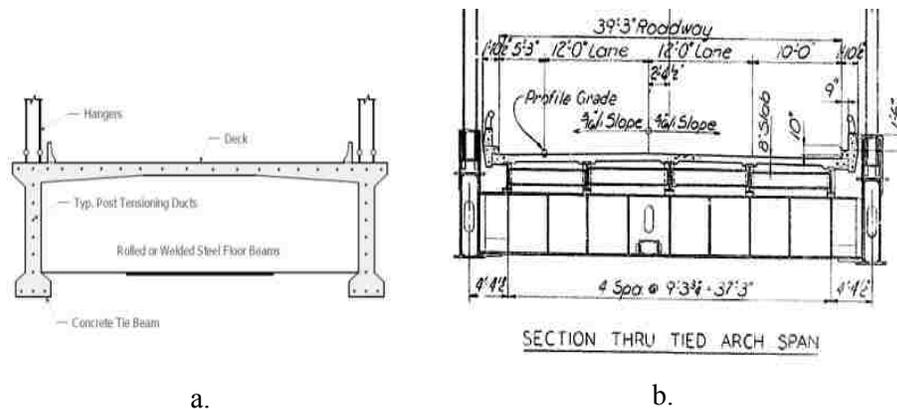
Alternate Bridge Cross Section from a. Hall and Lawin (1985). b. US 24 Cross Section
